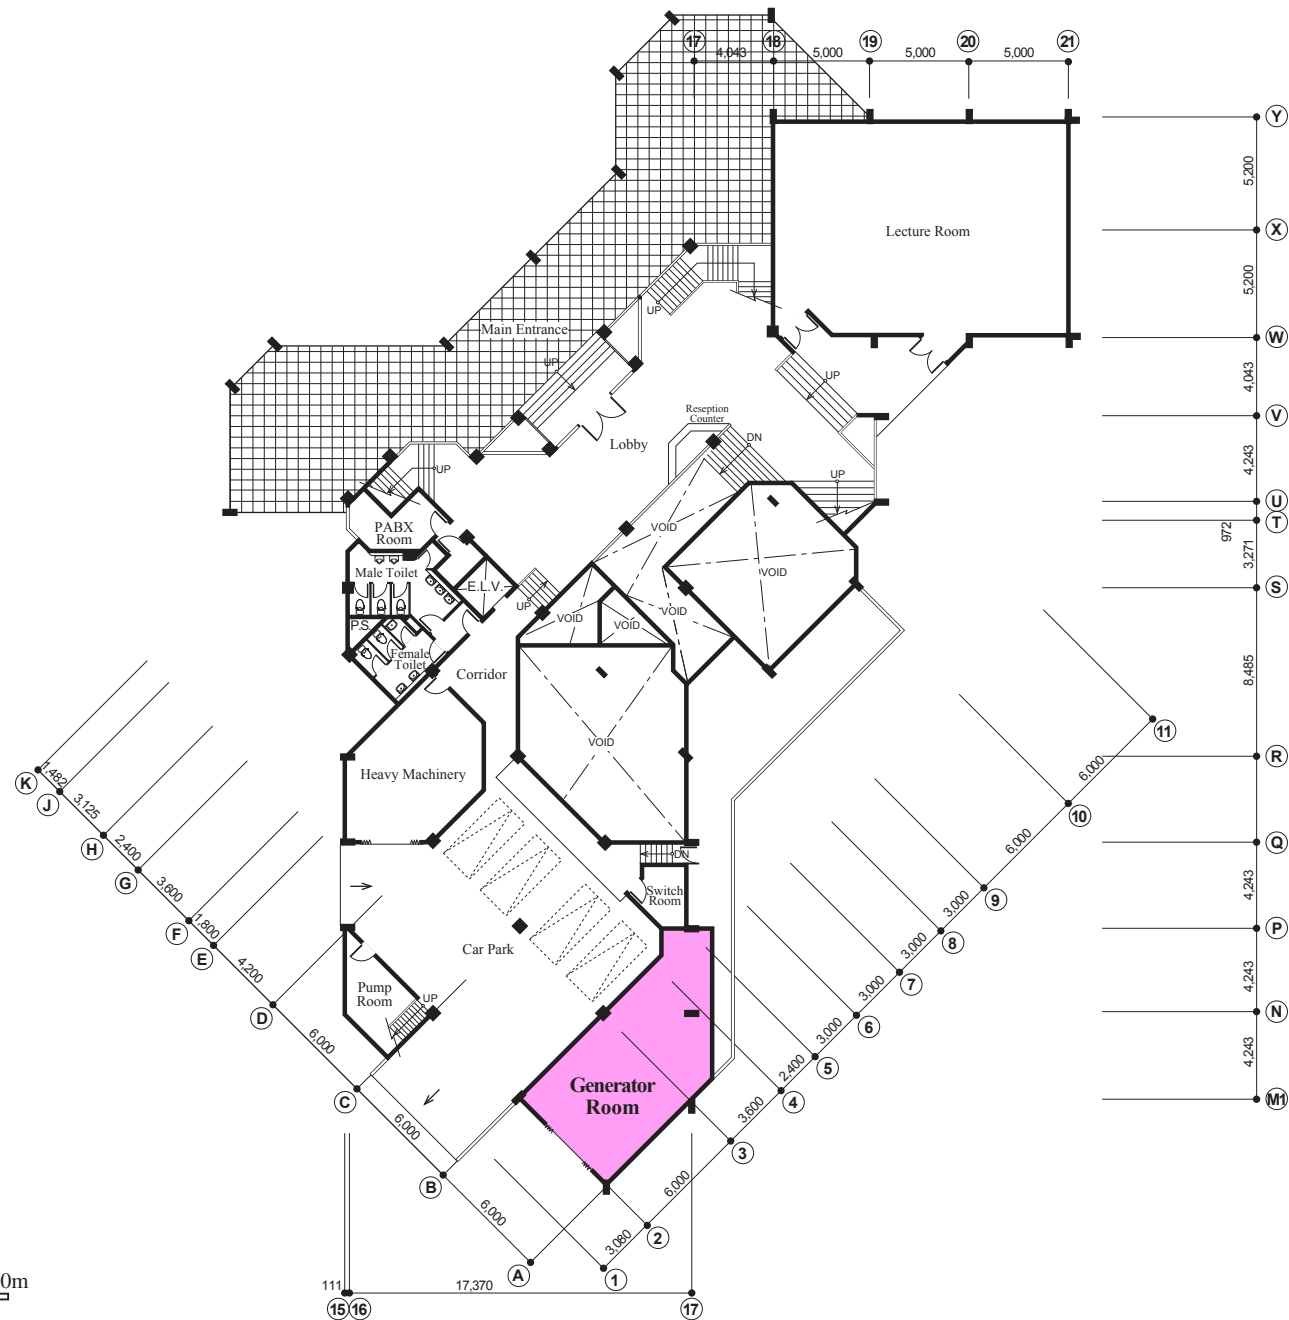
Ground Floor Plan of New Building for Department of Electronics & Telecommunication Engineering
